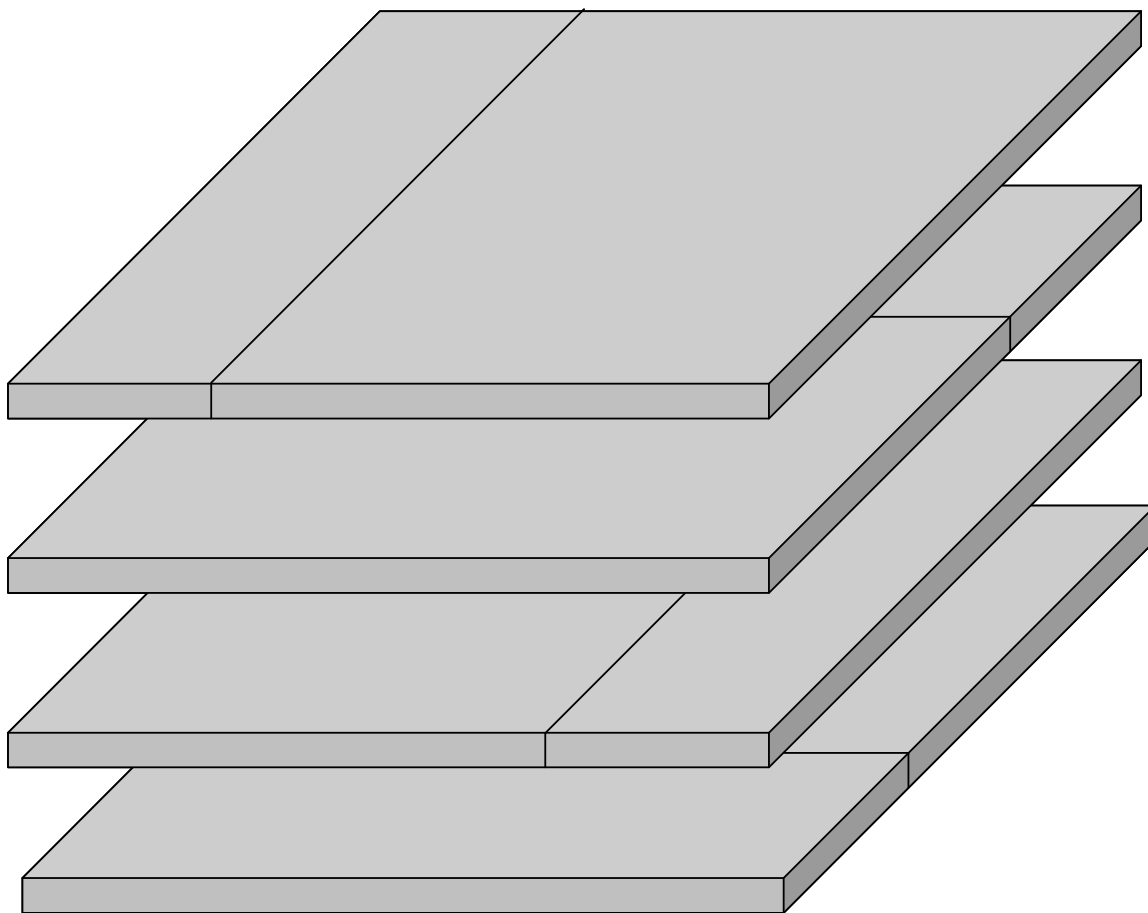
Concrete backer board stacking schematic (each layer rotates 90 degrees) used to create concrete subfloor for testing.
